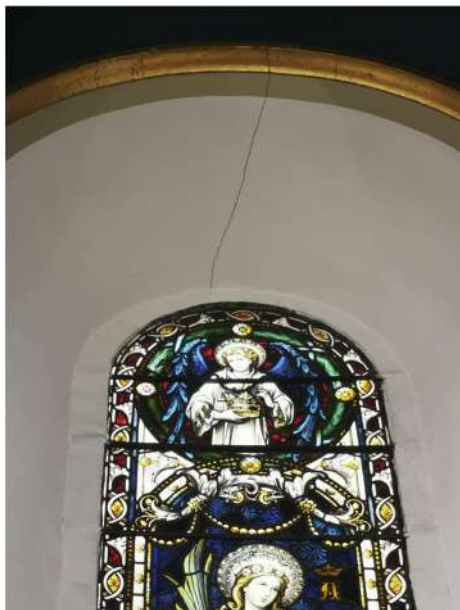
Vertical cracks and flaked plaster south east corner wall
